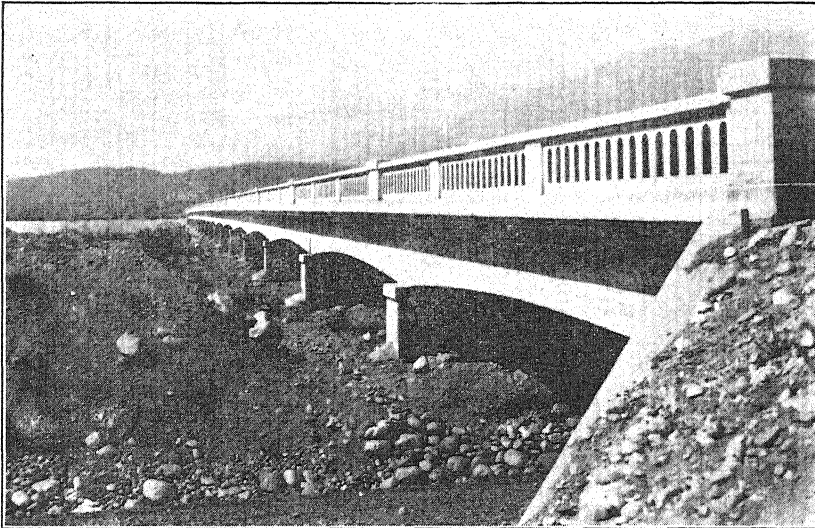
View of Bridge with Reinforced Concrete Railings. (See p. 391.)
